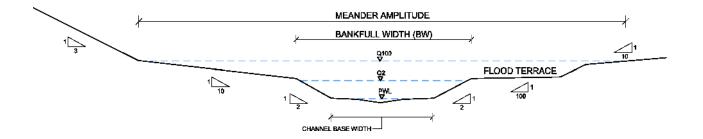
Typical section of the Roslyn Stream realignment in terms of flooding profiles
